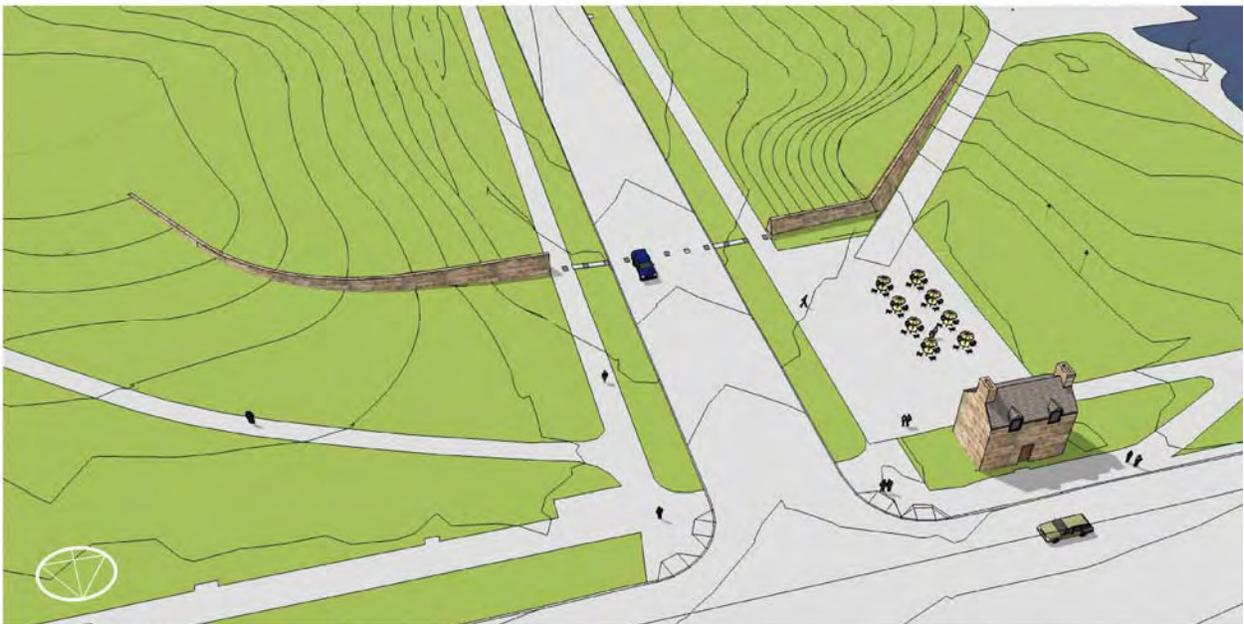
1A Arc Wall Rendering, Phase 2
